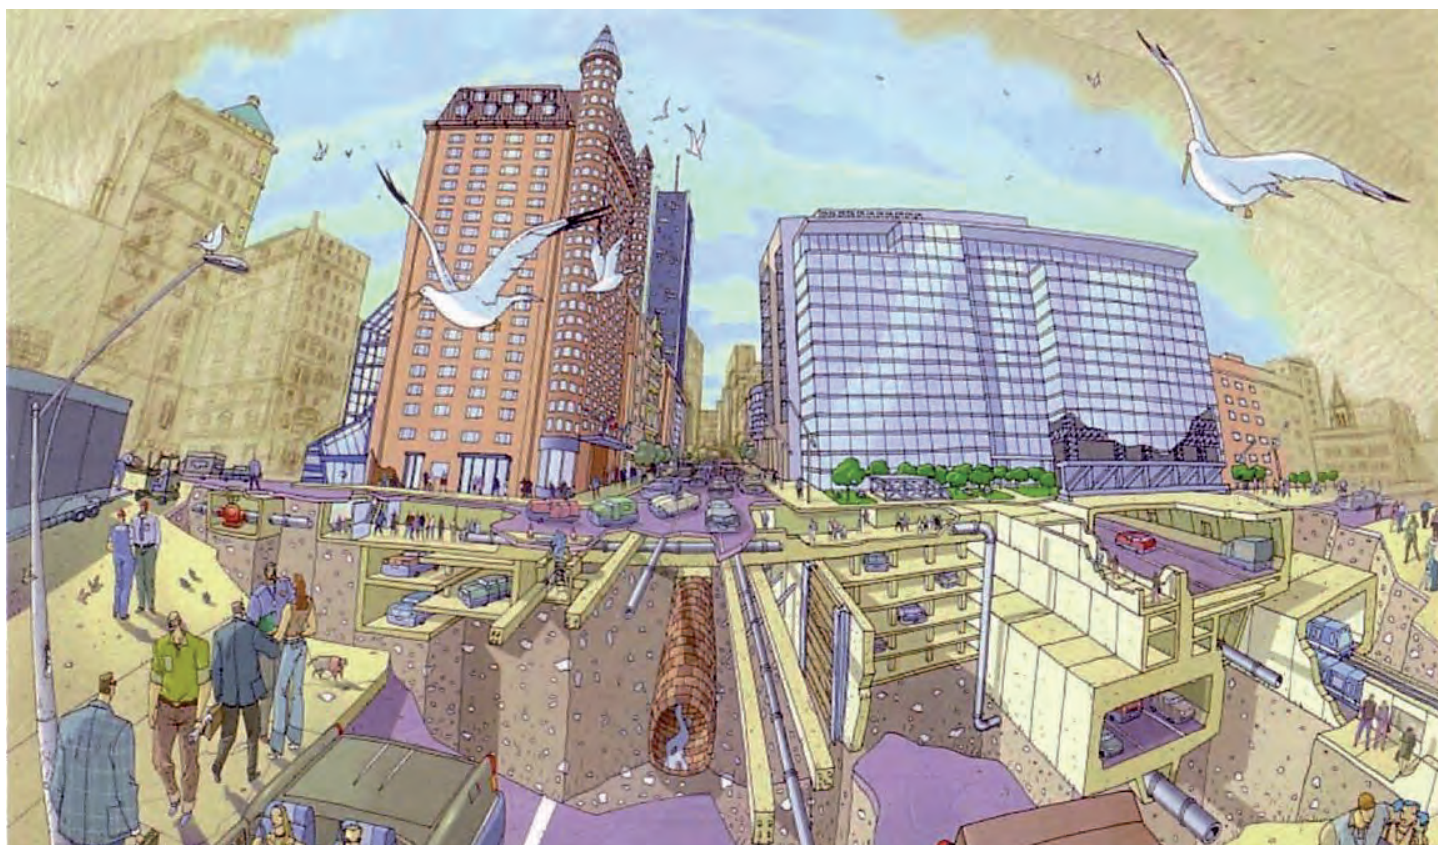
International District Underground Montreal, Artist Pierre Brignaud.
